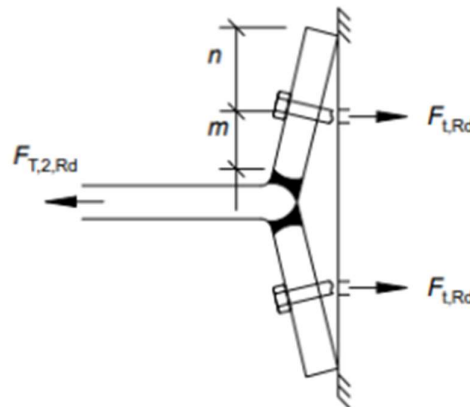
Bolt failure with flange yielding (SCI P398)
